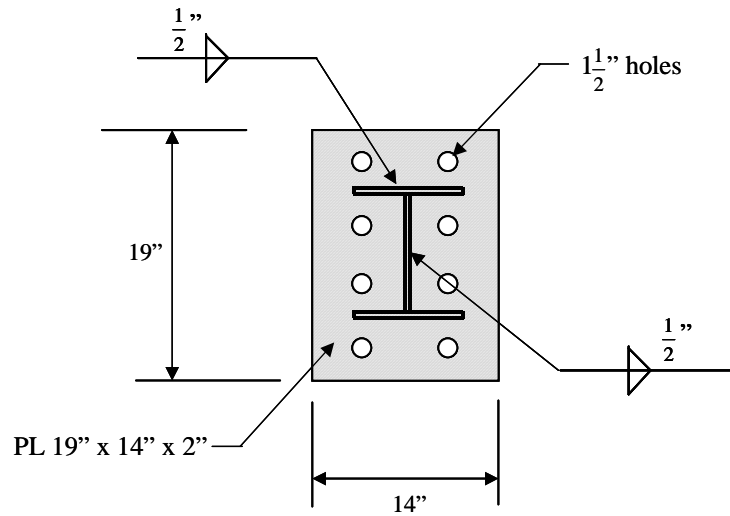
Typical Beam to End Plate Connection Detail (Arce, 2002)
